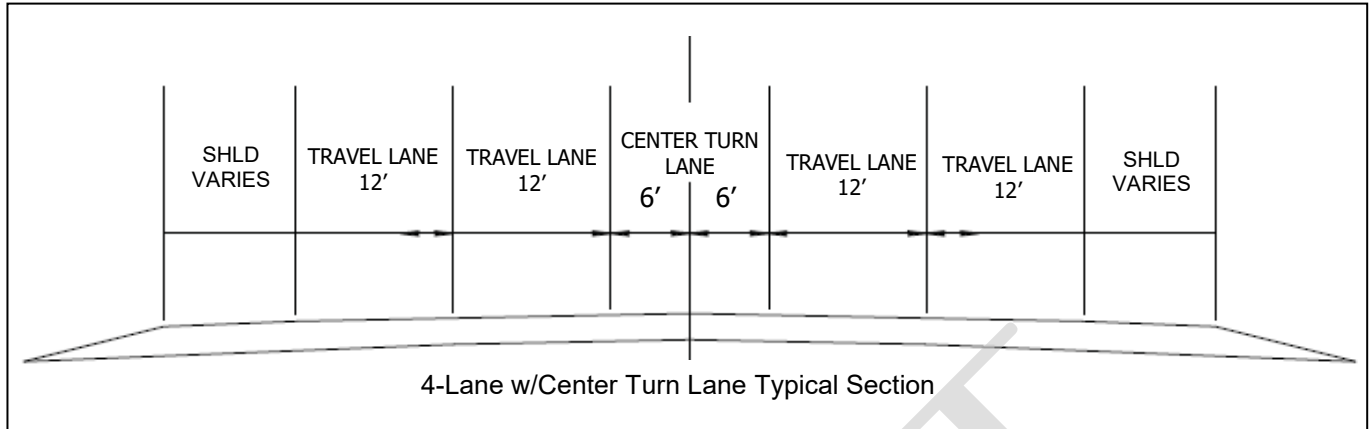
Proposed Typical Section-Full Build: SR 32 (US 321) from SR 73 to Penland Road
